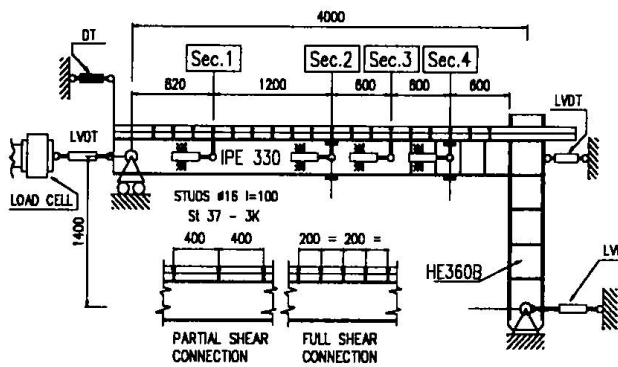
Lay-out of substructure with full shear connection and relevant measurement apparatus
